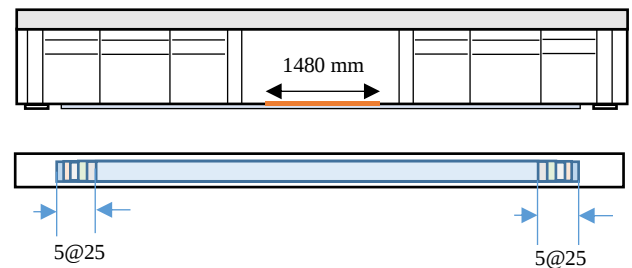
Damage and CFRP layer attached on tensile flange
